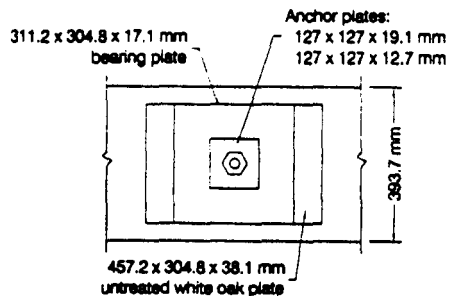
Typical discrete plate anchorage system (Dean bridge). Plate sizes vary for each bridge.
